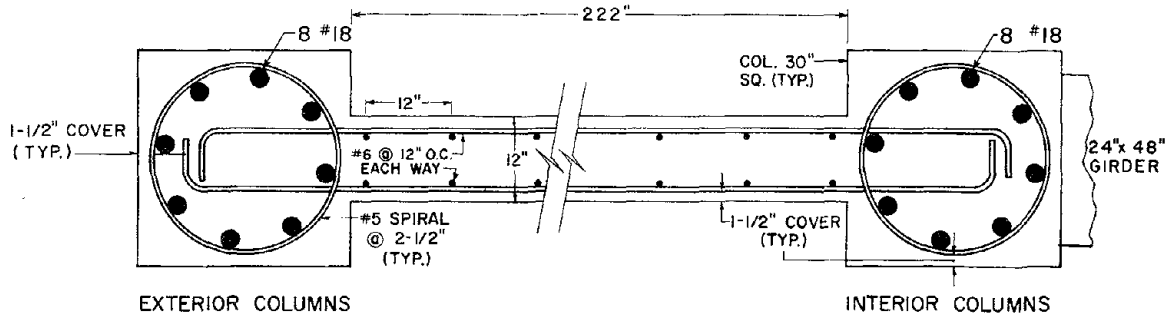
WALL CROSS SECTION DESIGNED BY UBC-73 PROVISIONS
